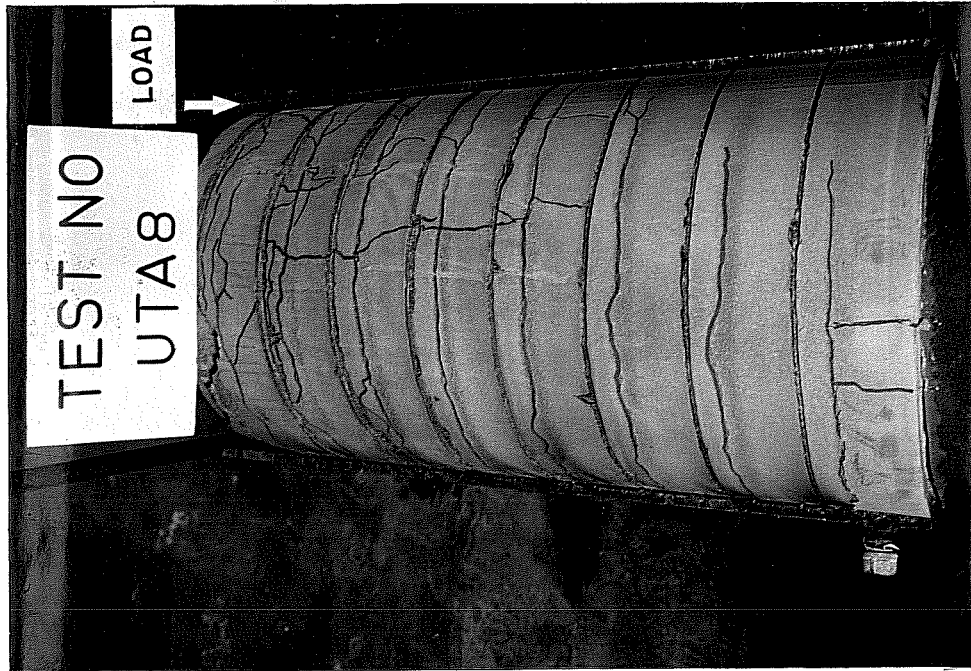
Grout surface on sleeve side for Specimen UTA8
